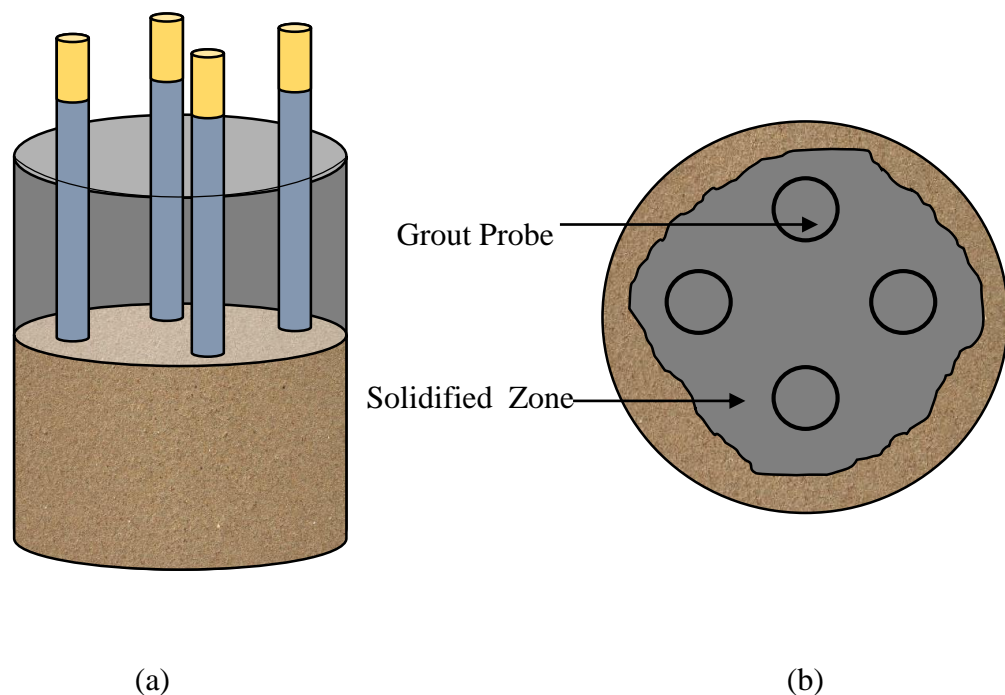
Process of permeation grouting in the cylinder: (a) inserted sleeve port pipe to inject grouting materials, (b) plan view after grouting
